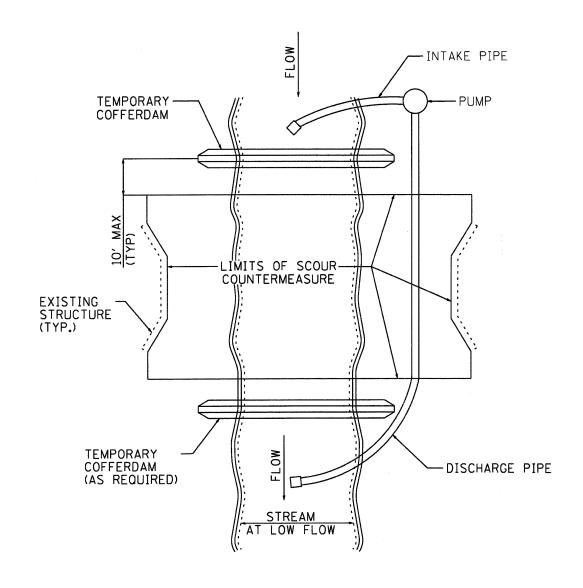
TEMPORARY COFFERDAM WITH PUMP BYPASS
